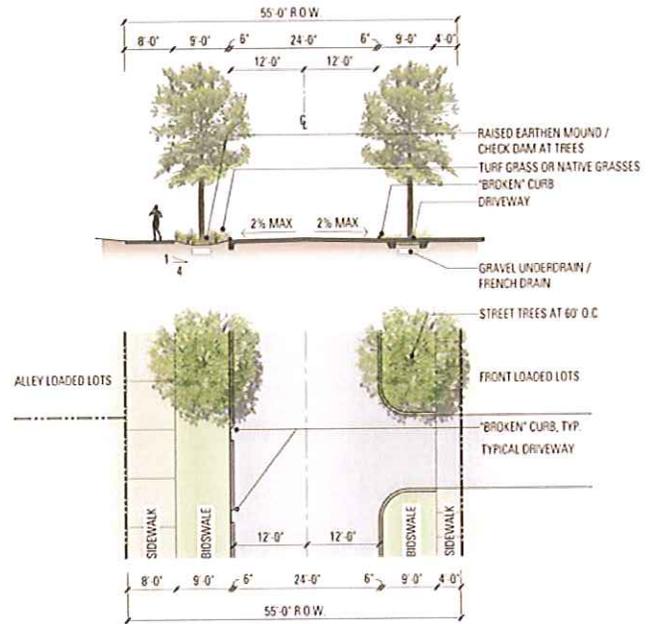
Typical Street Section 55' ROW, with 8' Trail, and 4' Sidewalk
